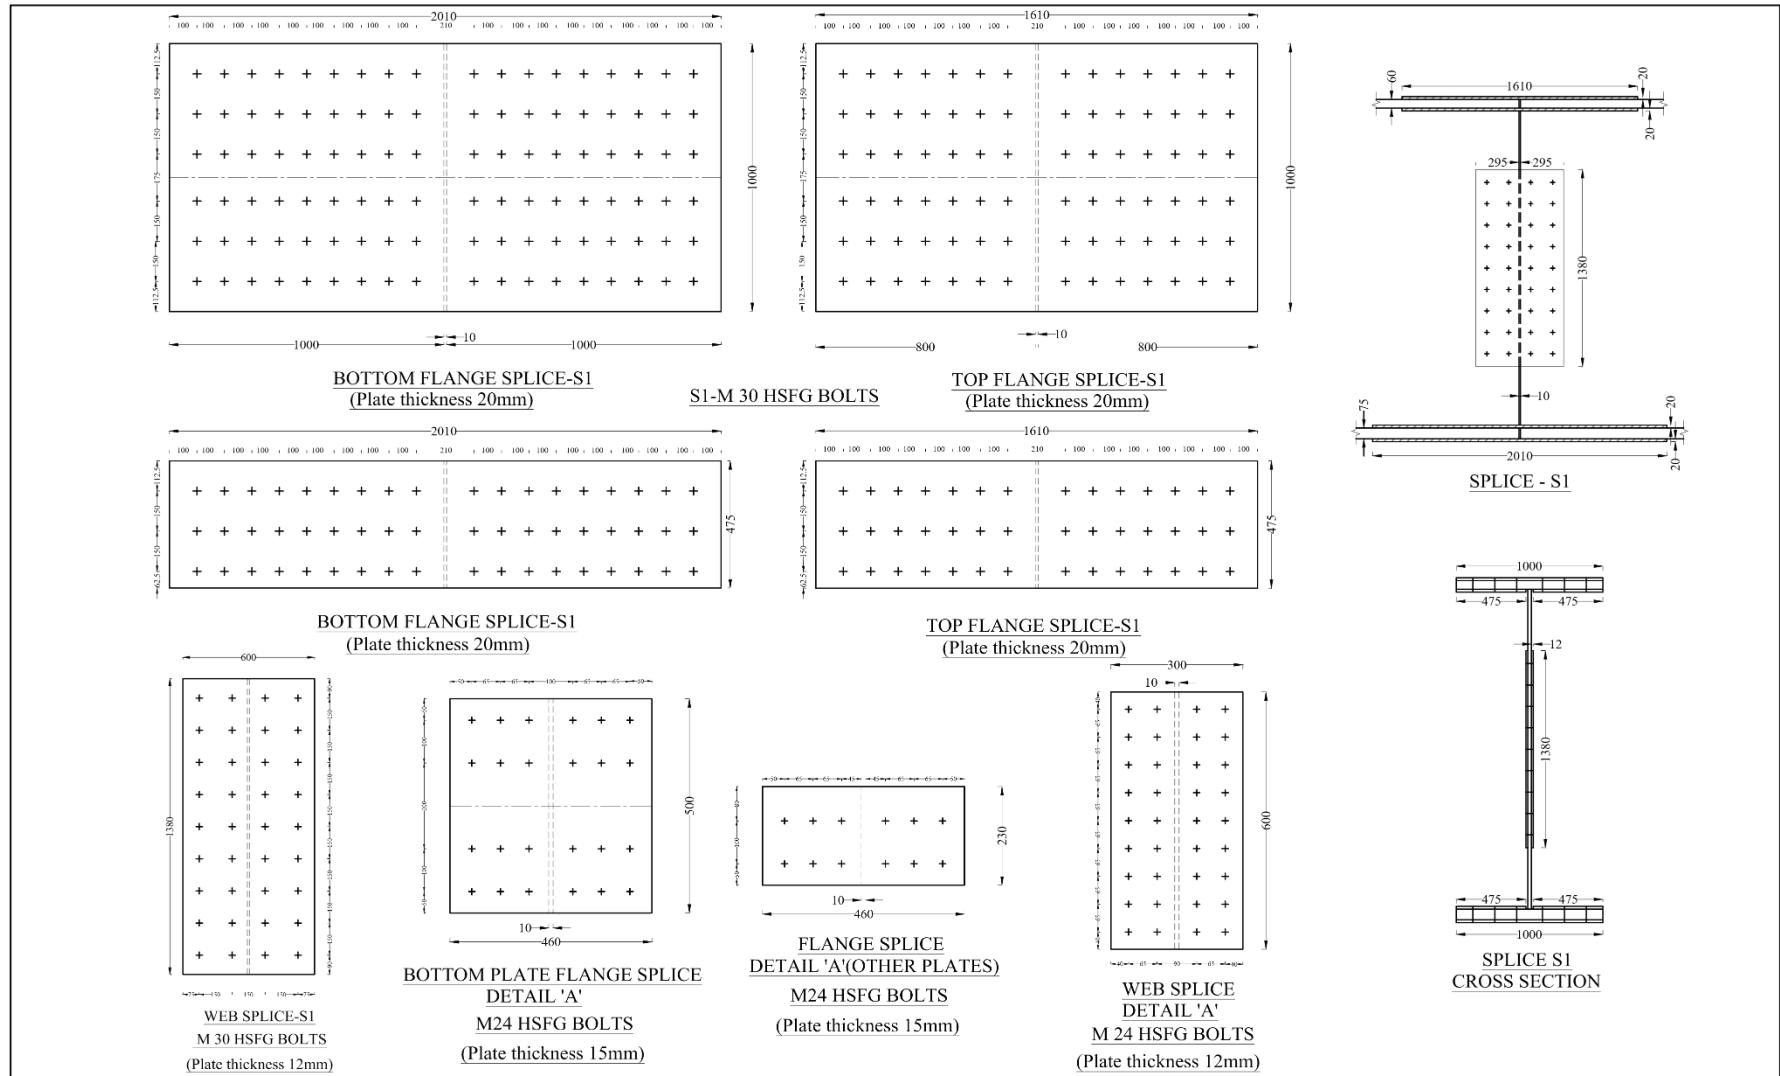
STEEL CONCRETE COMPOSITE LADDER DECK SPAN 50m
